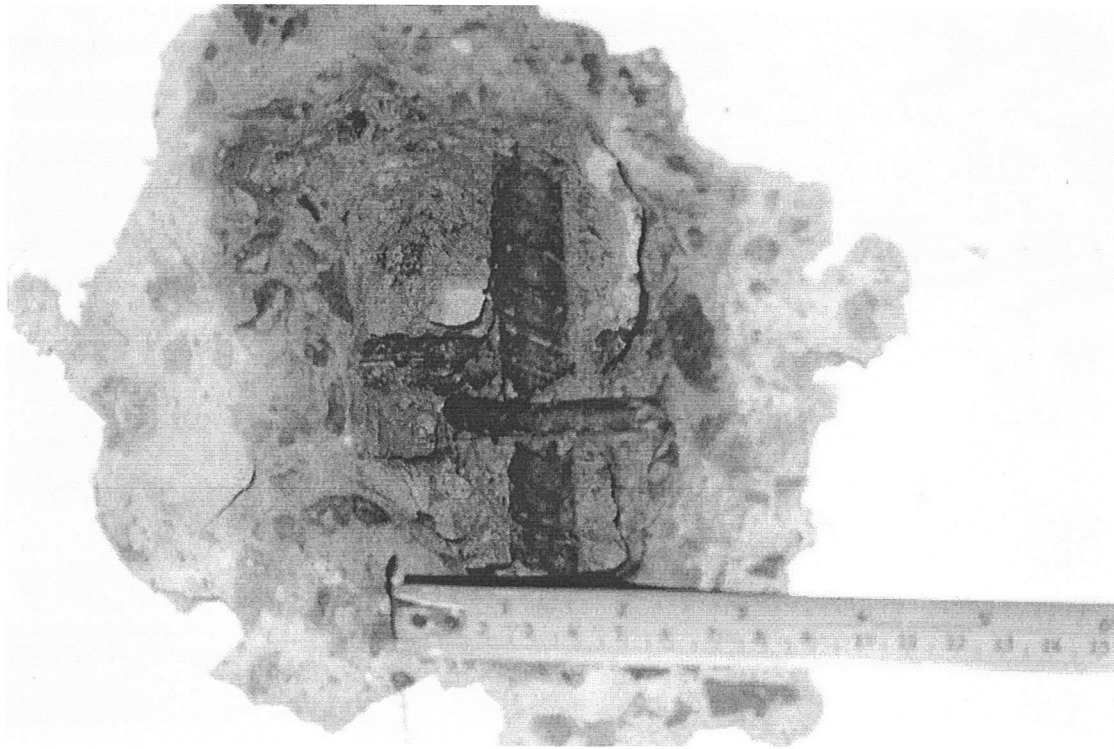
Invasive survey to determine the steel bar sizes of a reinforced concrete slab.
